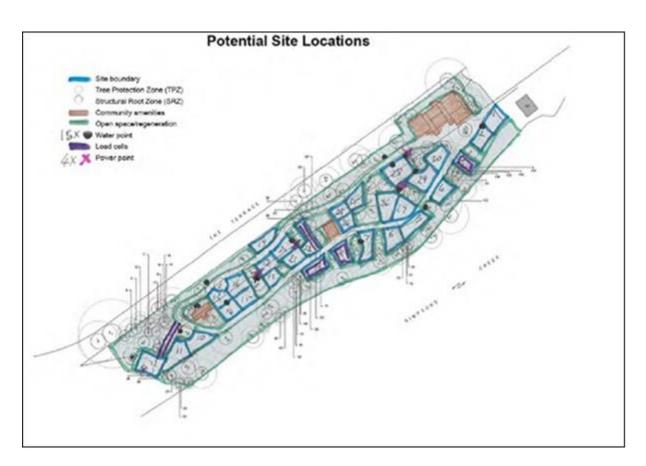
Proposed site plan from the Arboricultural Report showing potential site locations, regeneration/open areas, load cell installation sites, water and power points, and tree positions.
